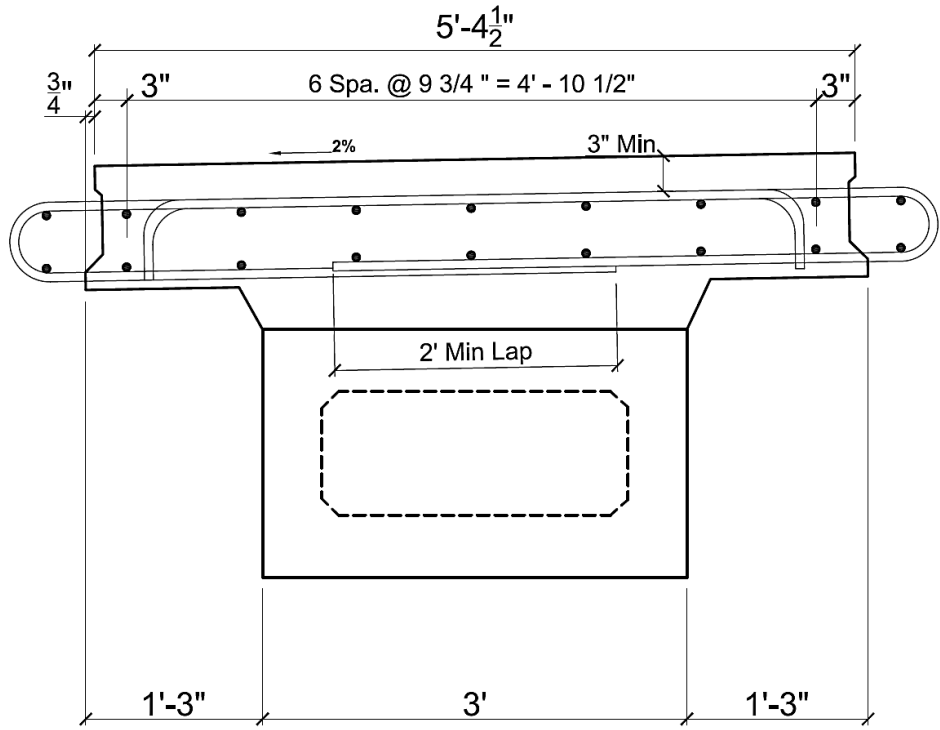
Decked box-beam section (Source: MDOT M-25 over White River Bridge plans 2010)
